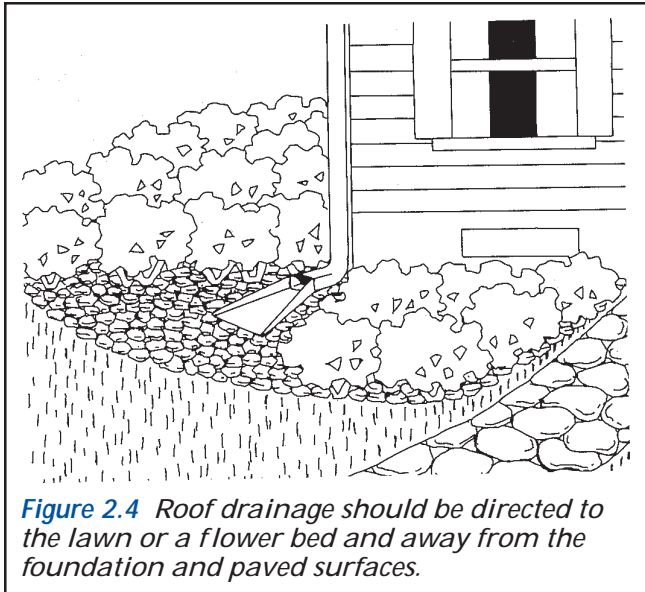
Roof drainage should be directed to the lawn or a flower bed and away from the foundation and paved surfaces.
